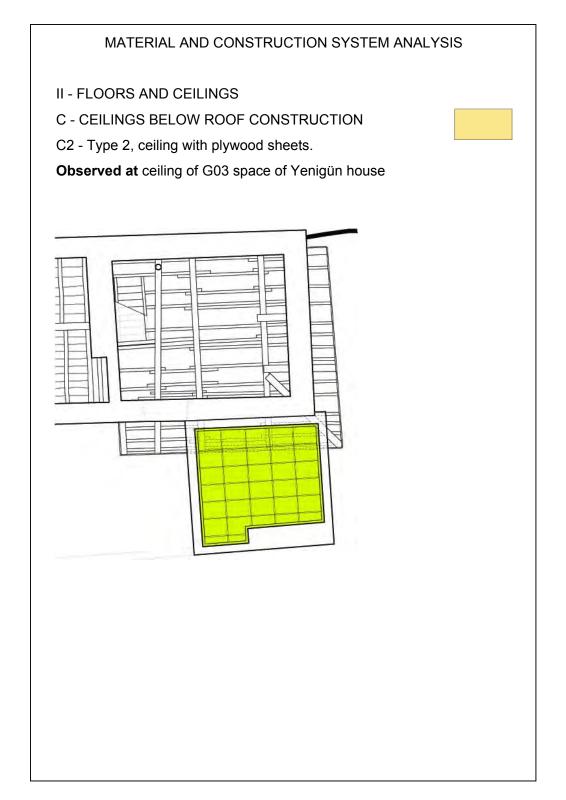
Material and construction system, ceilings below roof construction type 2
